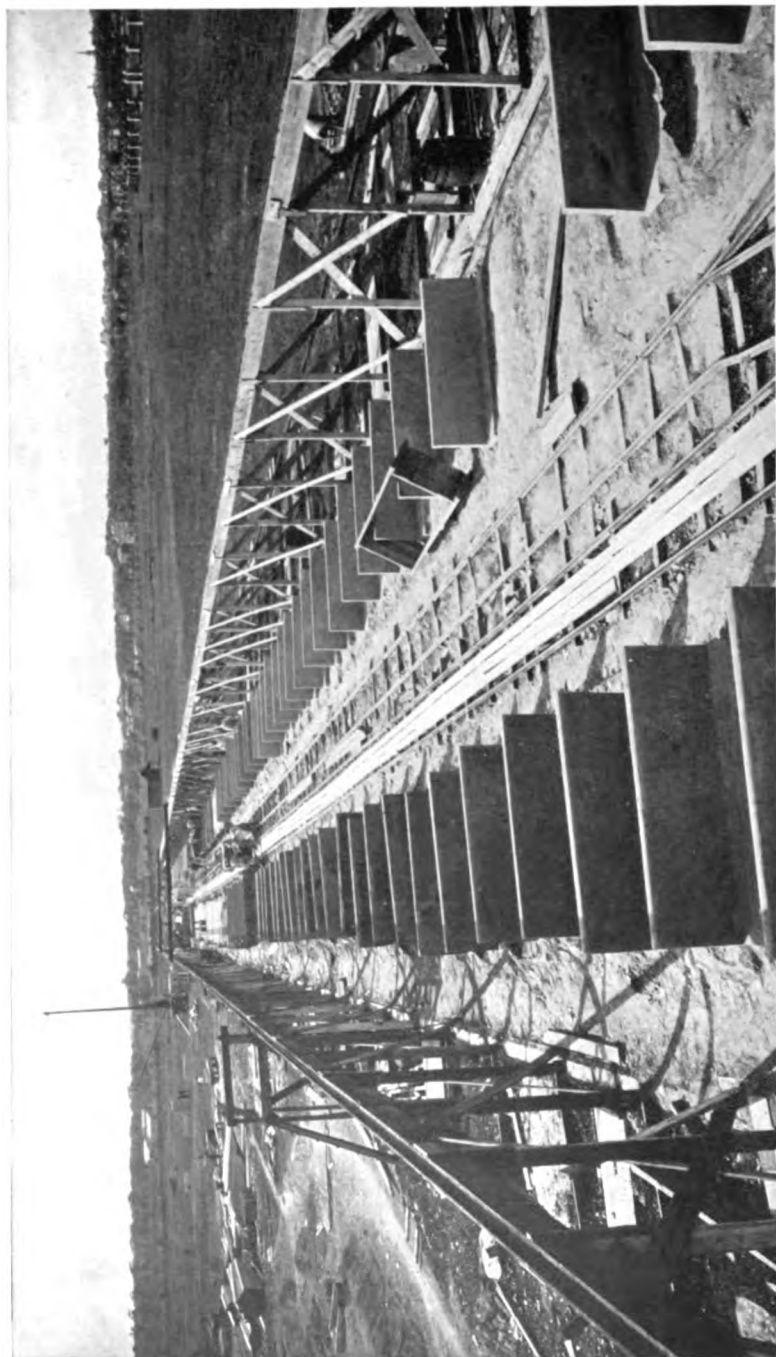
THE FOUNDRY FOR CASTING REEF SLABS.
